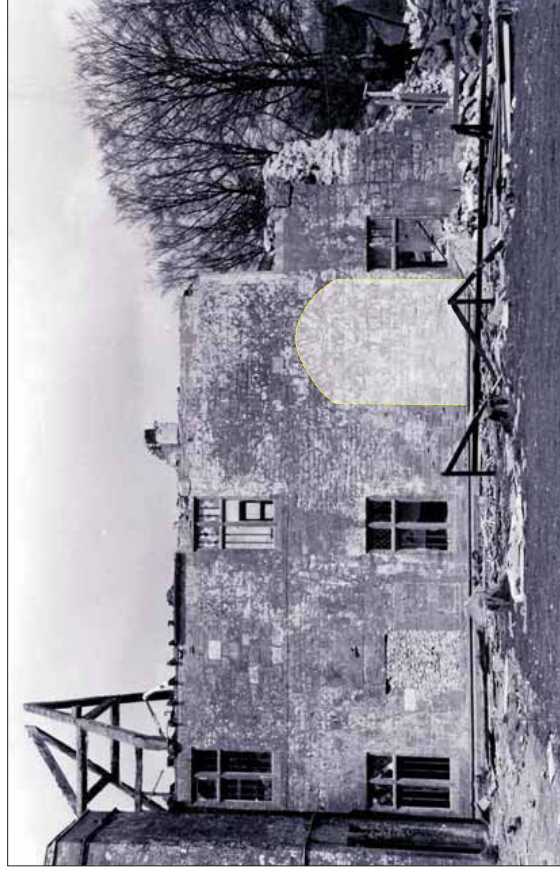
Photo of south facing elevation of the northern range showing the blocked archway, 1965.
